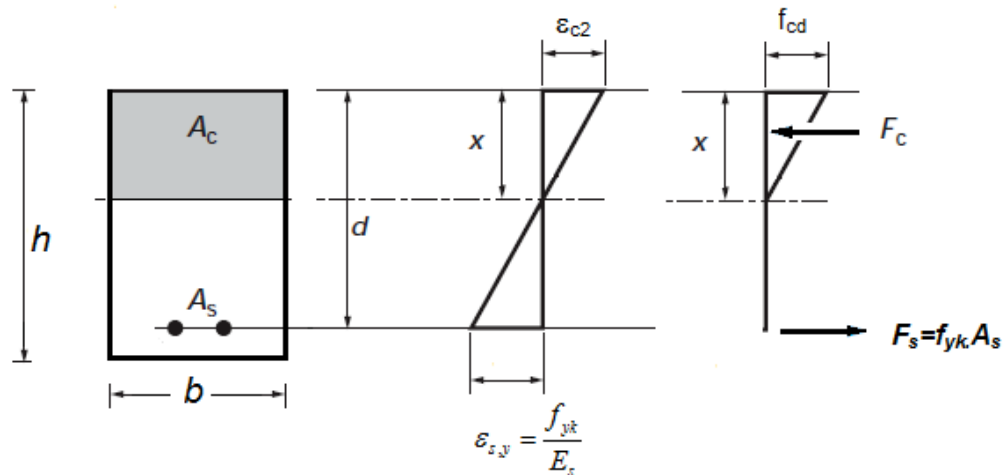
Behavior of reinforced concrete beam section with flexure at first yield.
